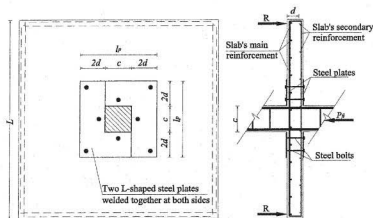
Strengthening and reinforcement details of a typical strengthened specimen
